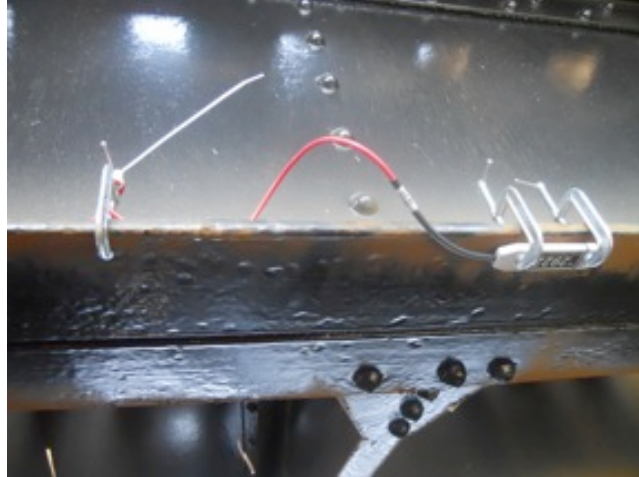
Typical installation of Strain Transducers to measure the strain in steel girders for NJ Transit Bridge in Bergen County.
